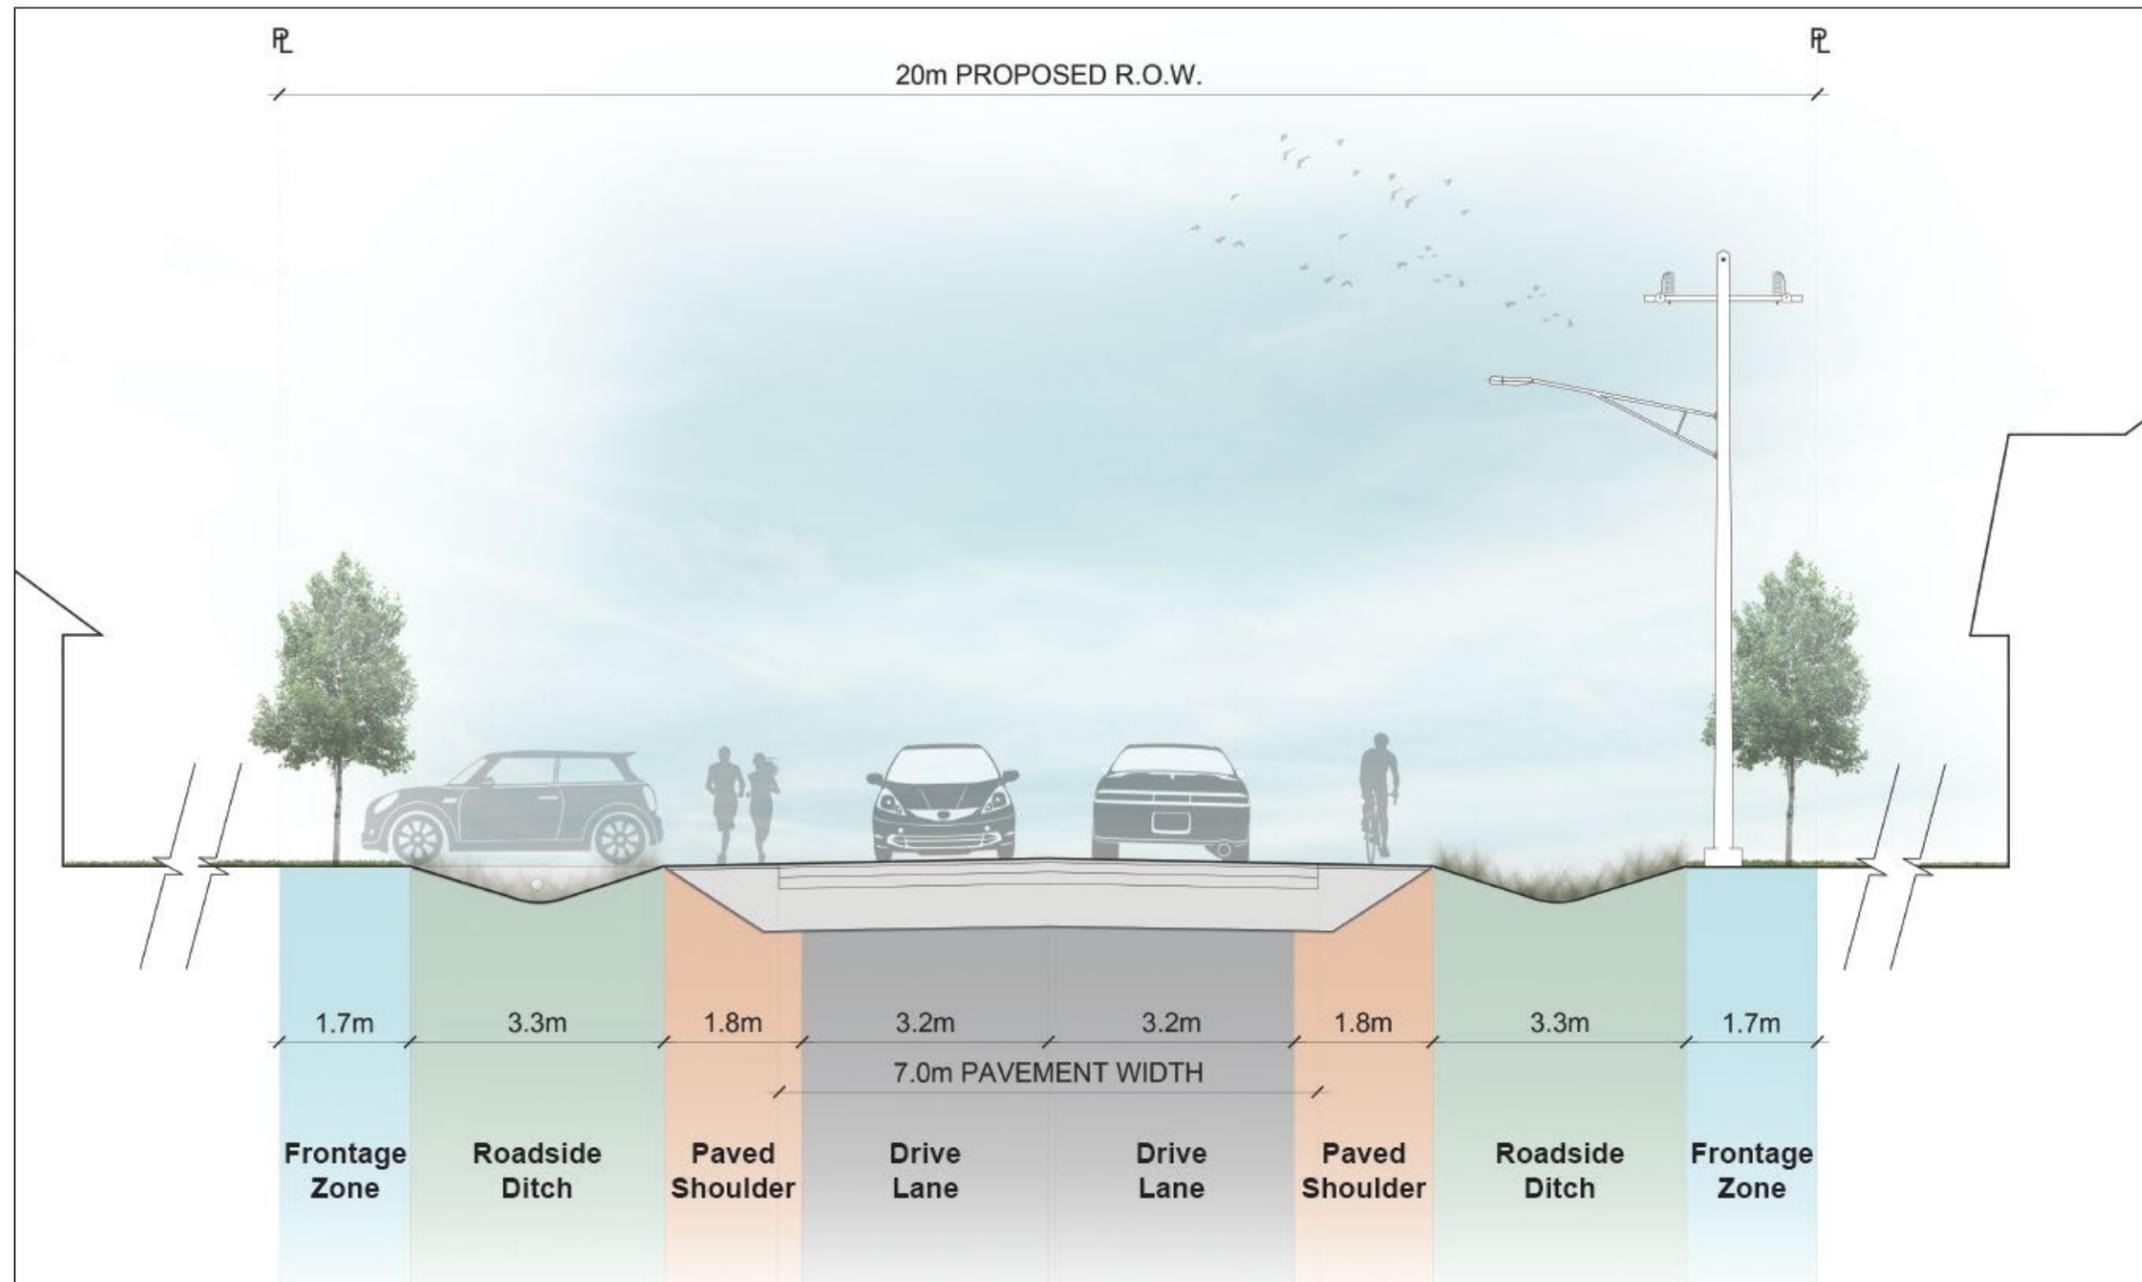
Neighbourhood Connector Street (Rural) – Conceptual Application A (Retrofit)
